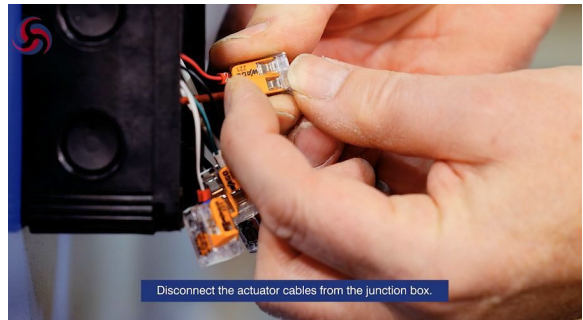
Disconnecting the actuator cables from the terminal block. Handle cables carefully so they are not damaged during removal.
